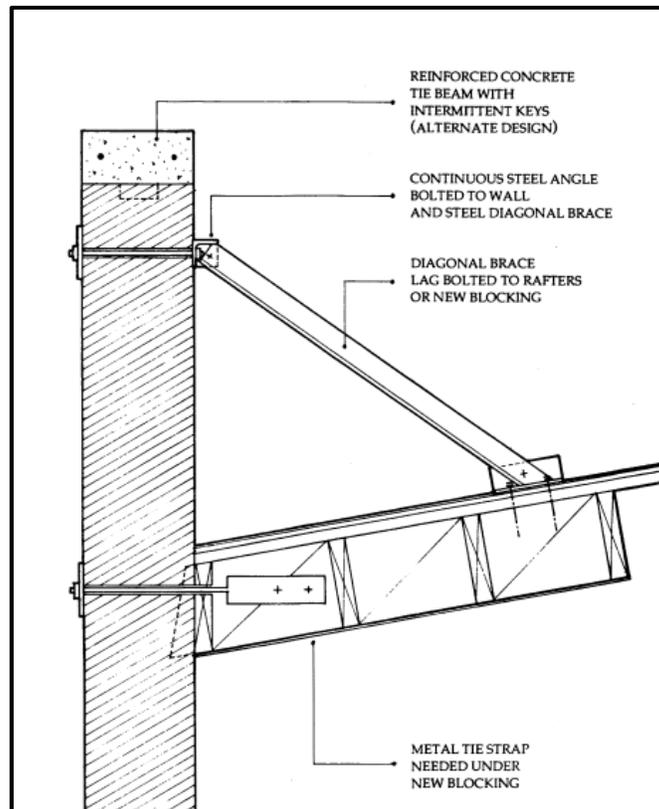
Parapet Bracing Detail (From Wong, 1987)
